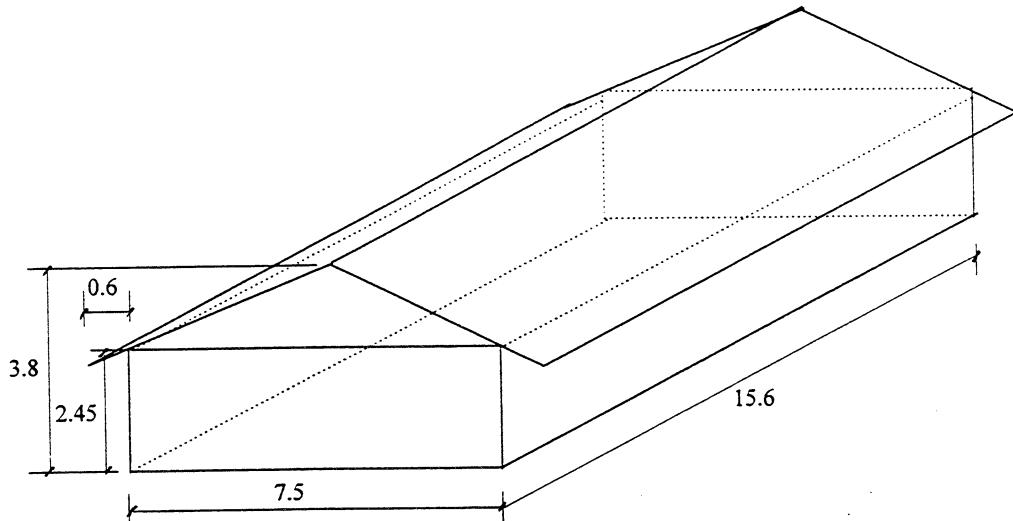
The Full-Scale 7.5 x 15.6 x 3.8 m “Matilda” Nu-Steel House Tested at the CSTS
